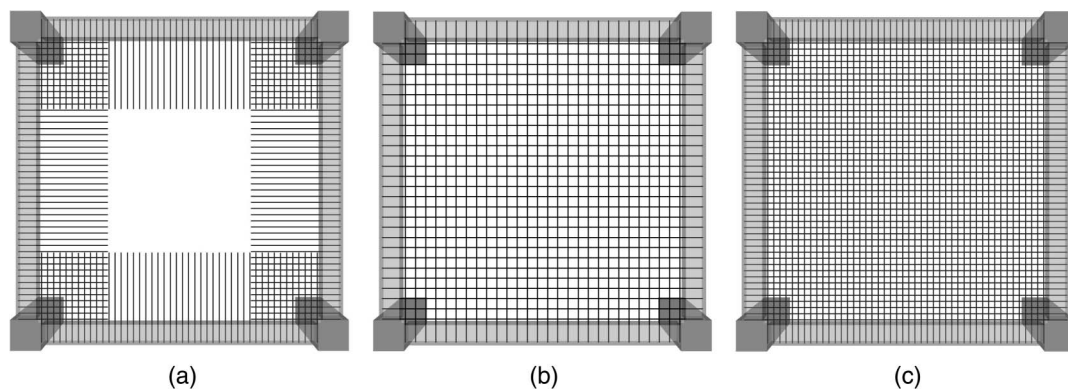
Modeling of slab reinforcement with two-node line elements in the numerical study: (a) discontinuous top reinforcement of the ACI slab with 120 mm spacing; (b) continuous bottom reinforcement of the ACI slab with 200 mm spacing; (c) top and bottom reinforcements of the UFC slab with 120 mm spacing
